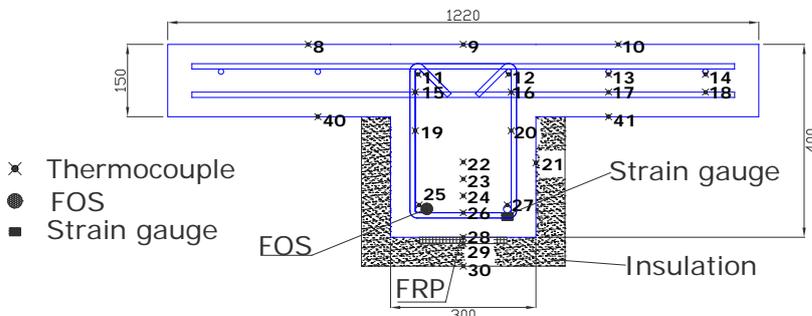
Details of reinforcement and instrumentation for beams (dimensions in mm).
